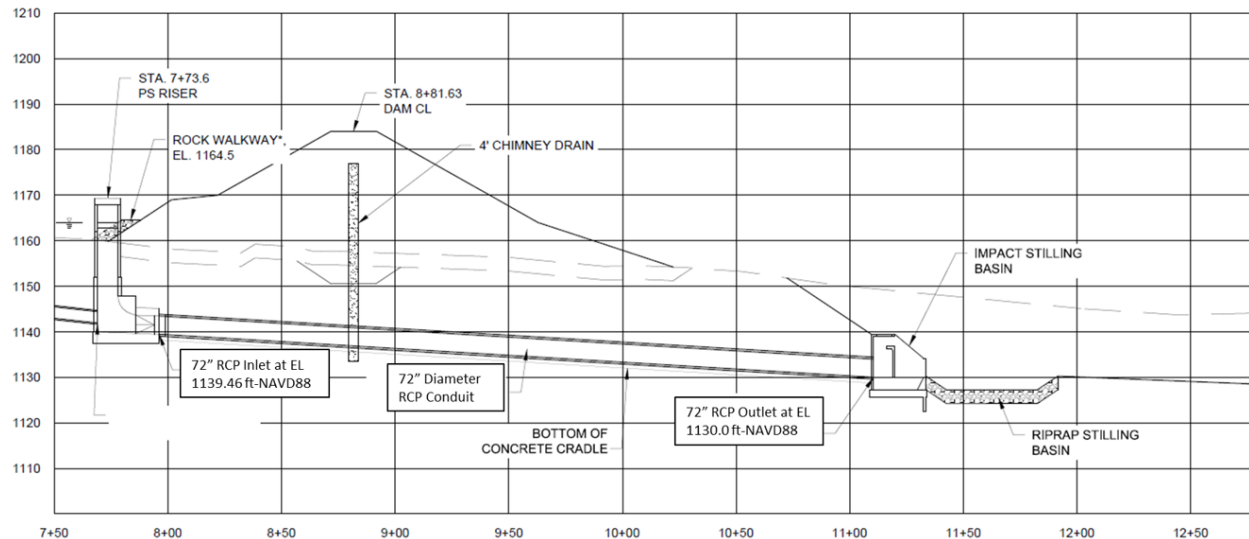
Outlet Works Design from HDR Engineering's 2018 Engineering Preliminary Design Report of Dam Site 19
